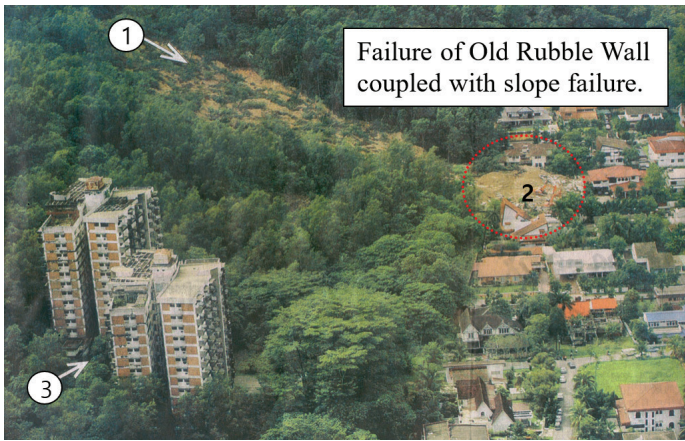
Wall and Slope failures at Taman Hillview (2002).
